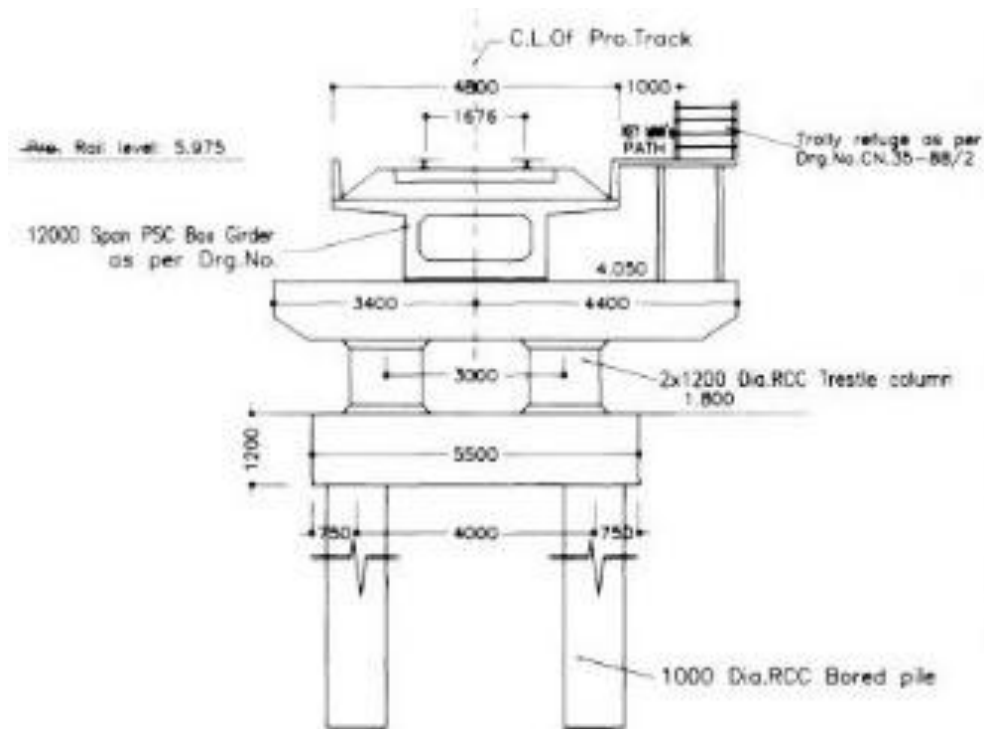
Section of PSC Girder of Br.No. 1233 DN
